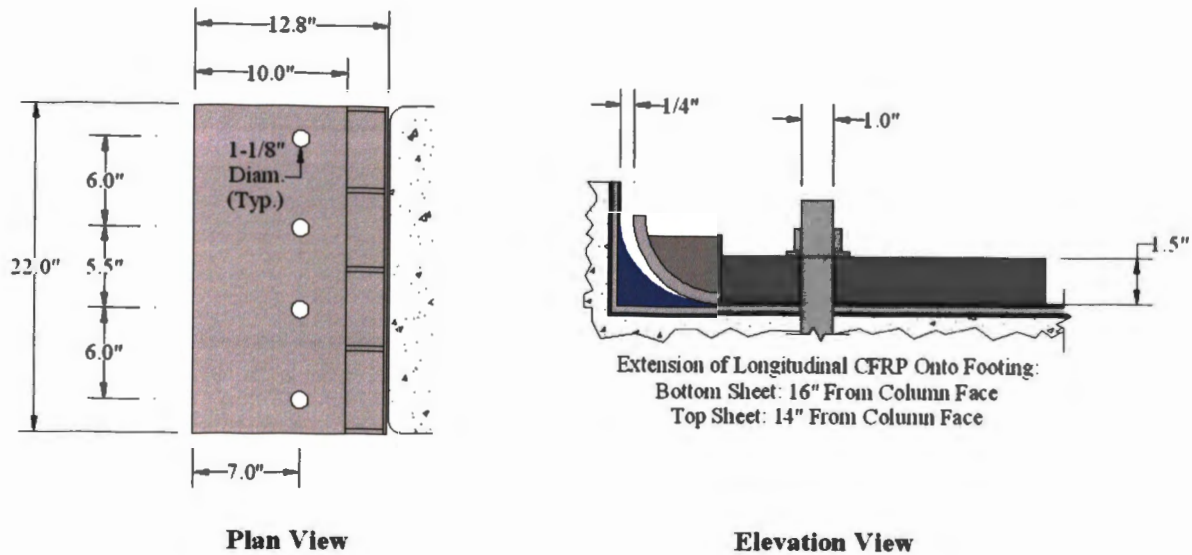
Final Details of Novel Anchorage System For Column #3
